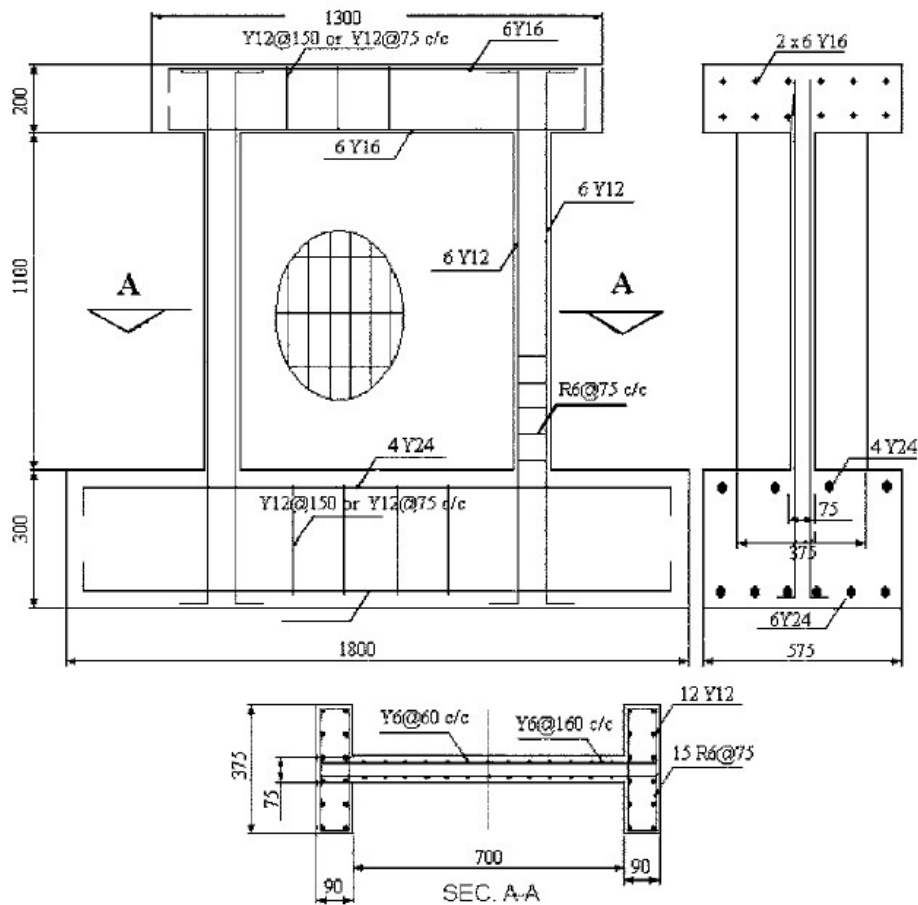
Typical details of walls tested by Emany et al (2008)
